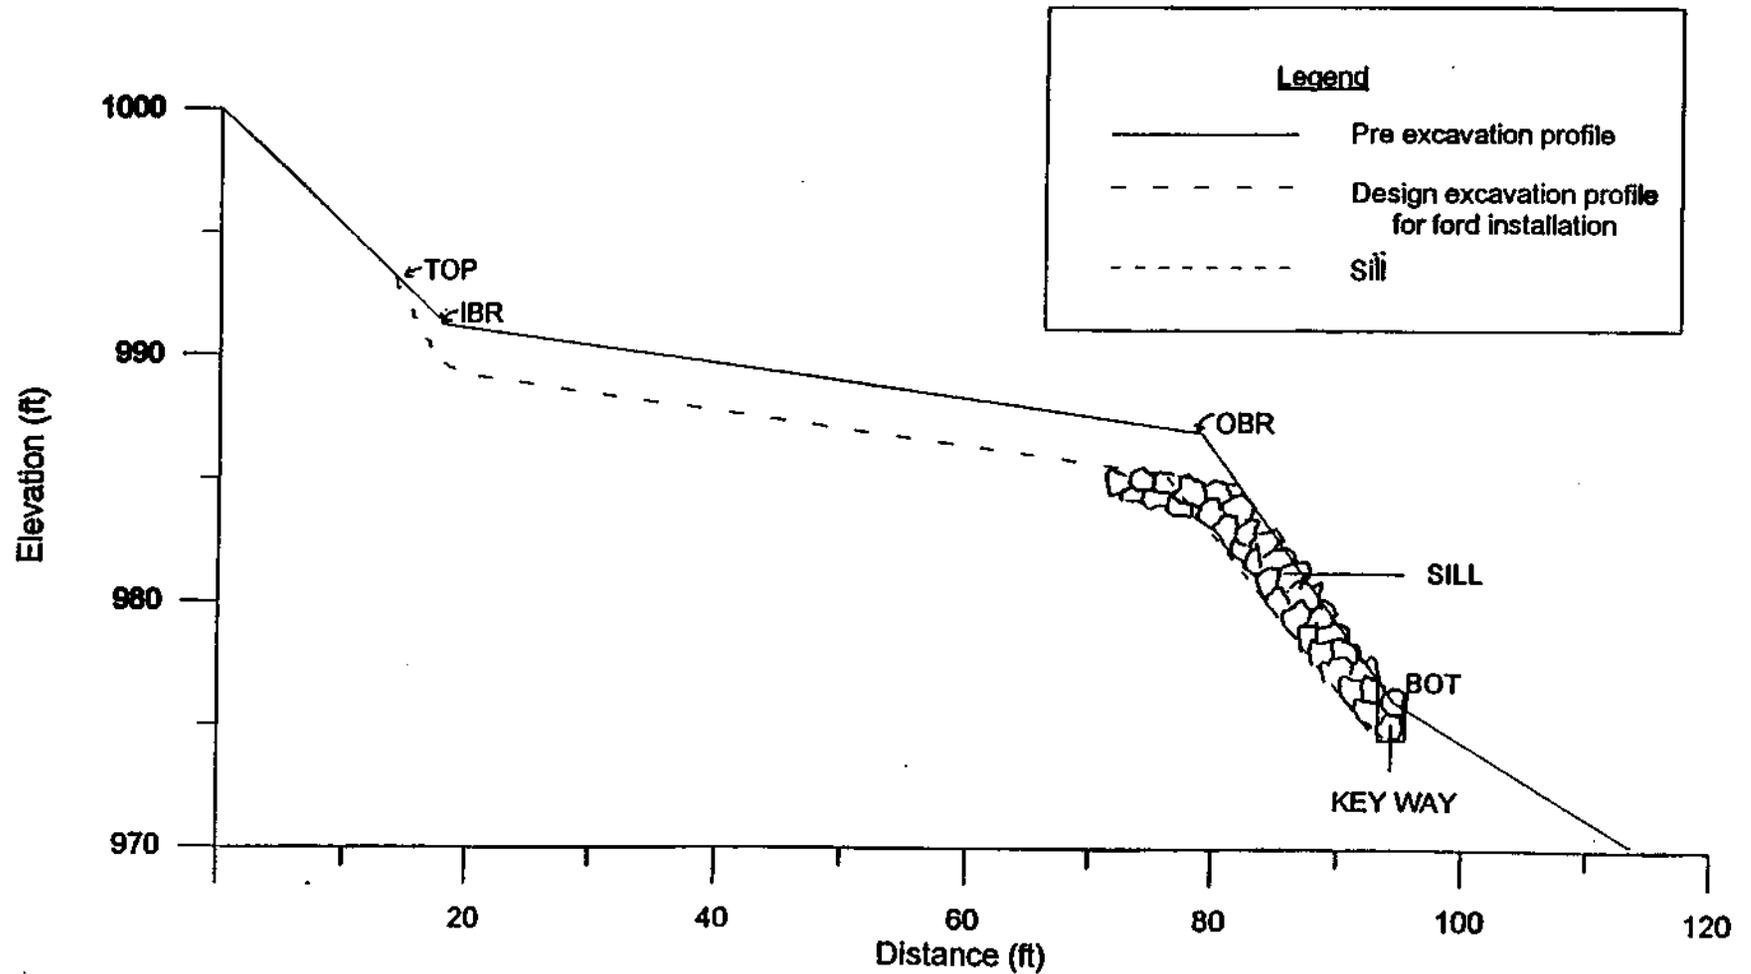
Butler Road: Site 12 Stream Crossing Pre & Design Excavation Profiles.
